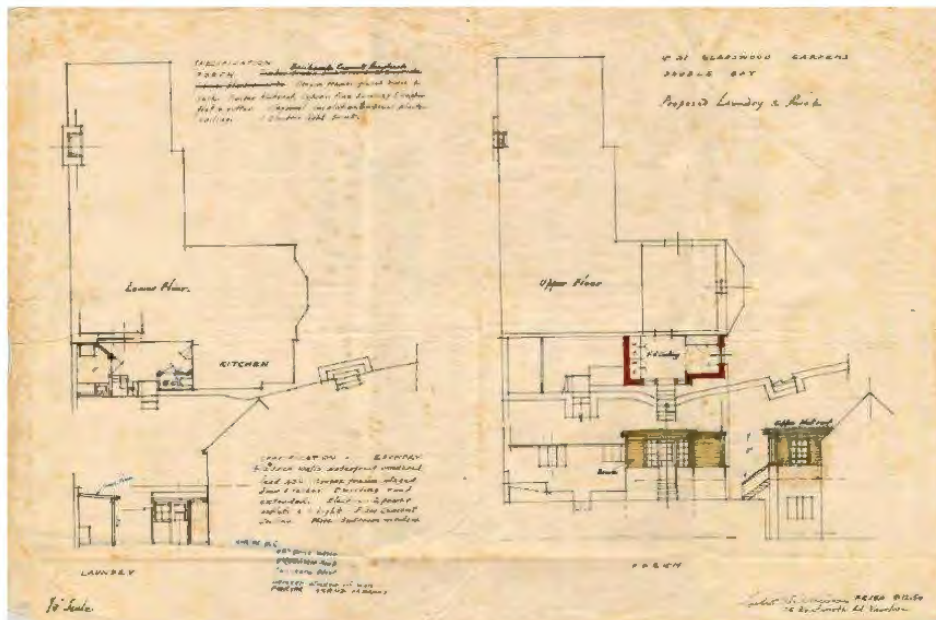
Plans from BA64/1951 (Source: Woollahra Records)
